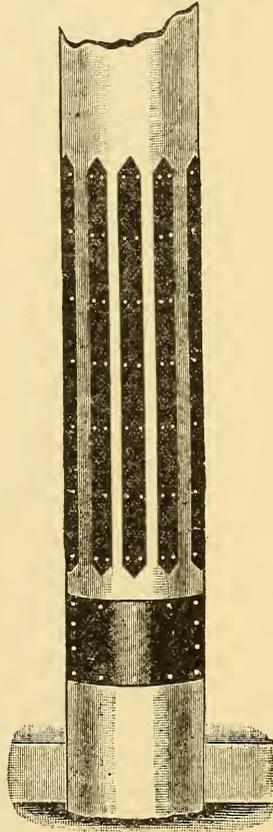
POLE STRIPS AND BUTT PLATES.
